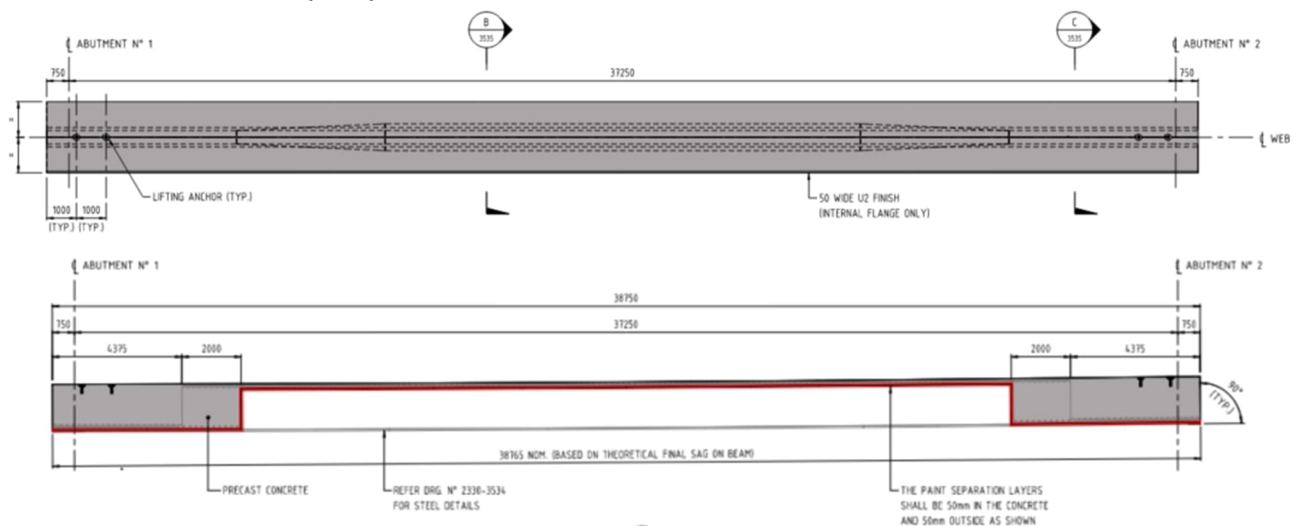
Plan and long section of a hybrid beam for Bridge 0997A
